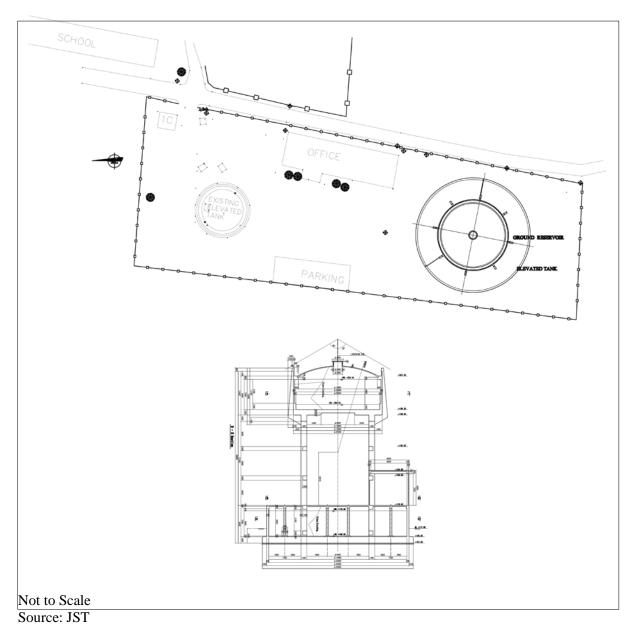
Plan of Salakham Distribution Center and Section of New Ground Reservoir and Elevated Tank
